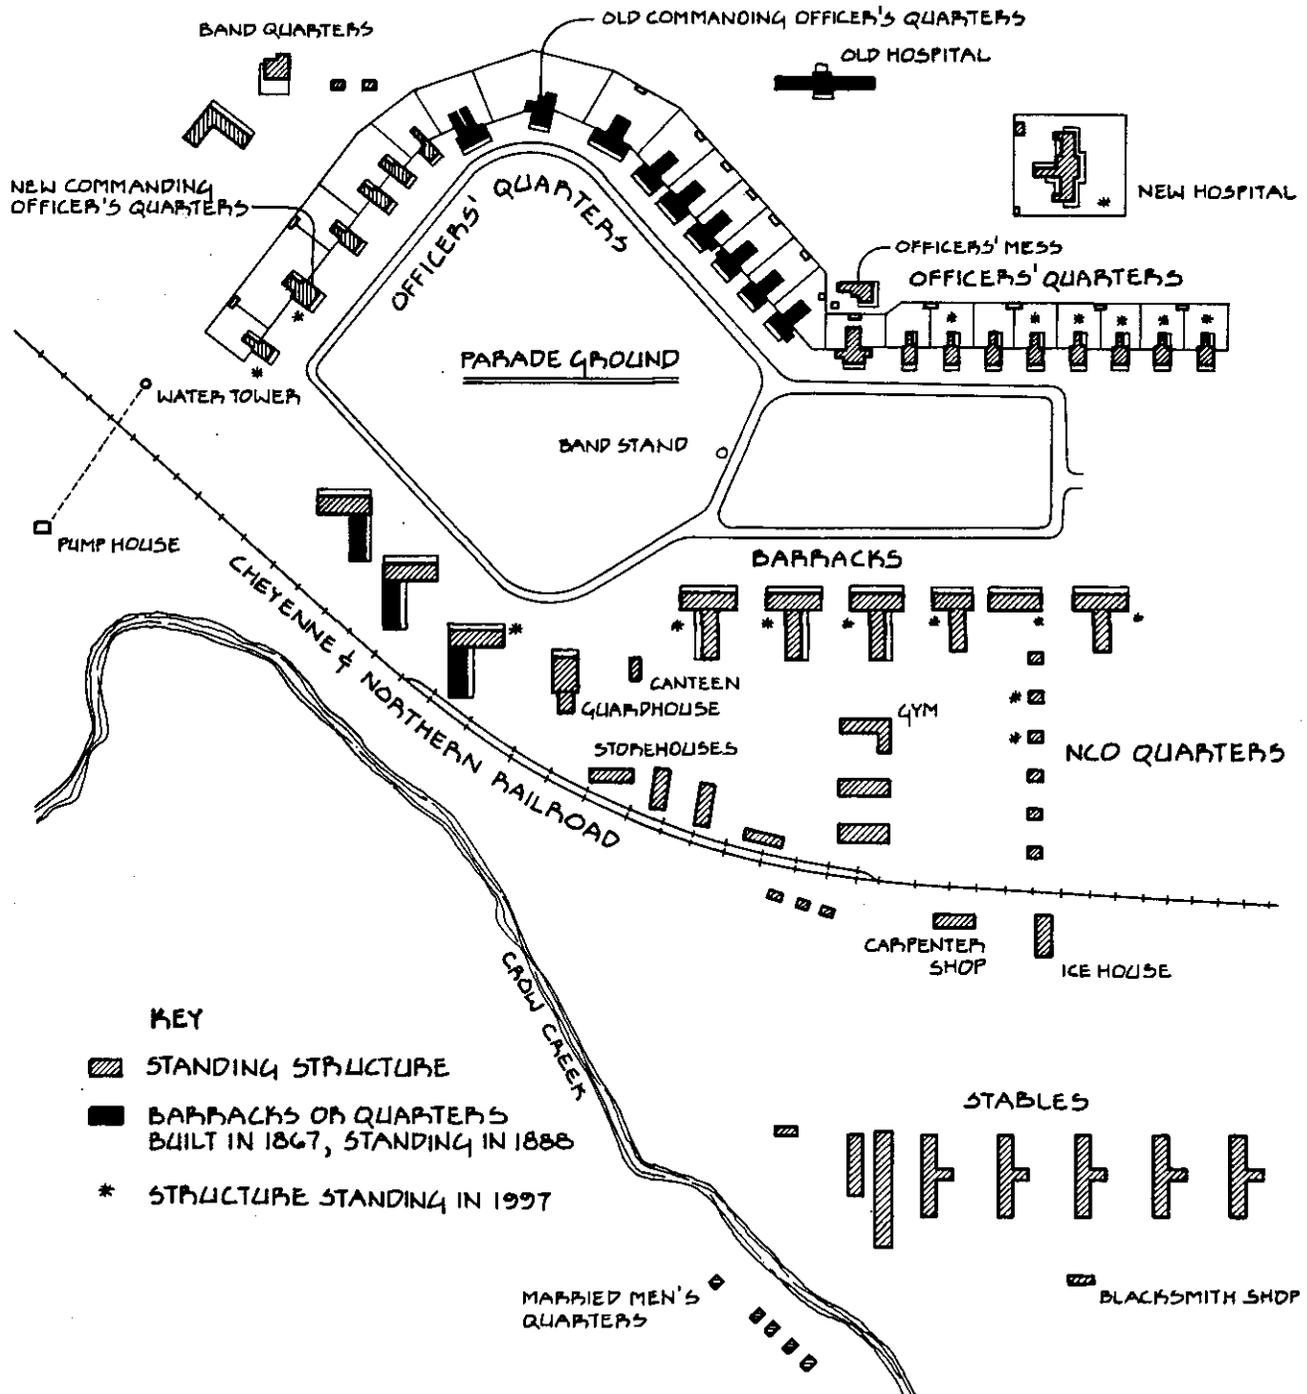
Site Plan of Fort D.A. Russell, 1888, from plan by C.F. Humphrey
